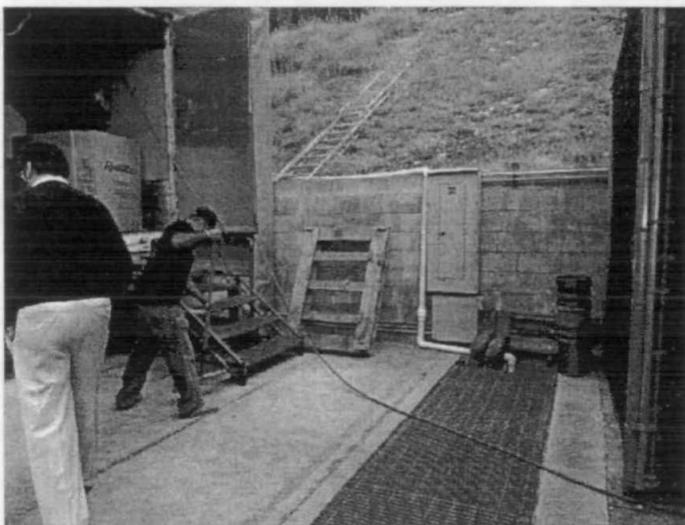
Pipe gallery and cleaning crew, note 2" PVC pipe to pump out pipe gallery
